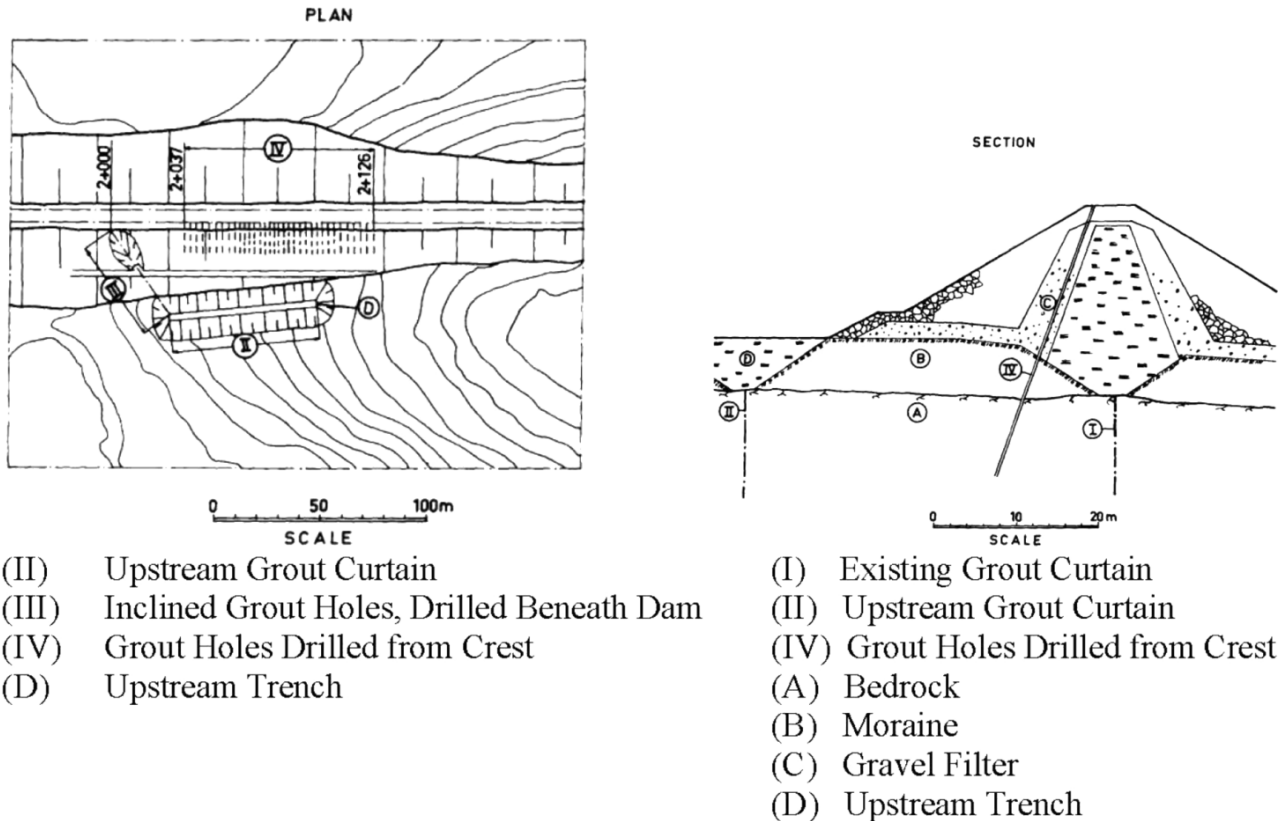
Plan and section of remedial grouting (Bernell and Scherman 1970).
